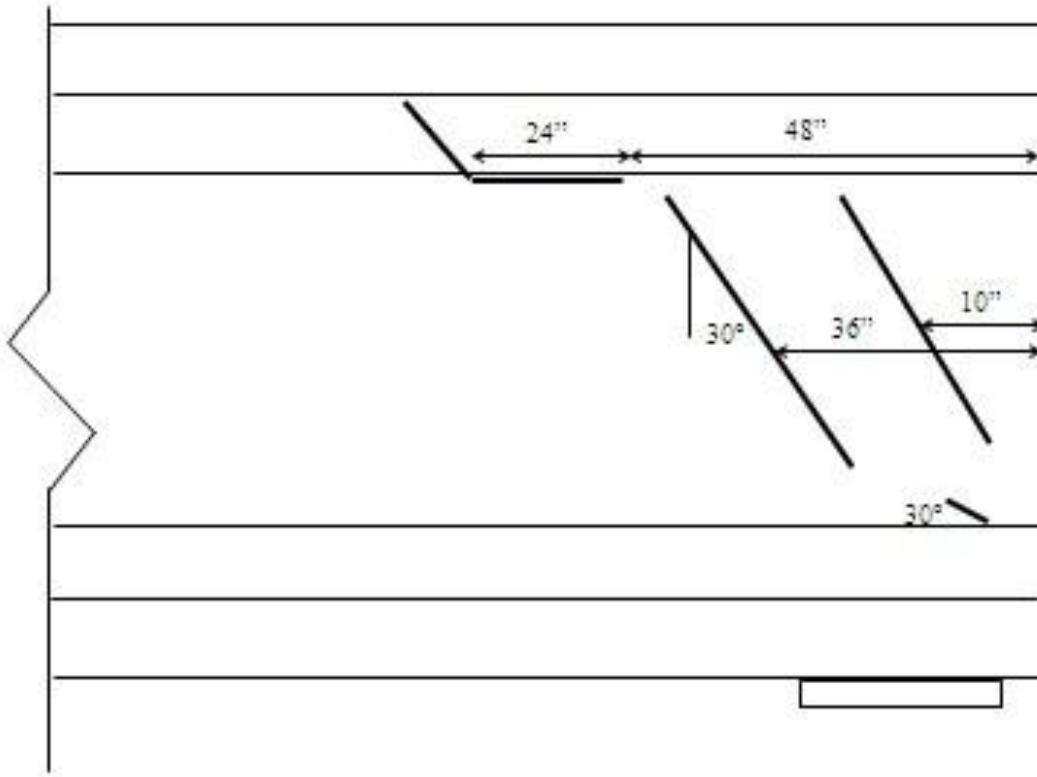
Crack diagram for east-most exterior girder, east face, north abutment (#1830).
